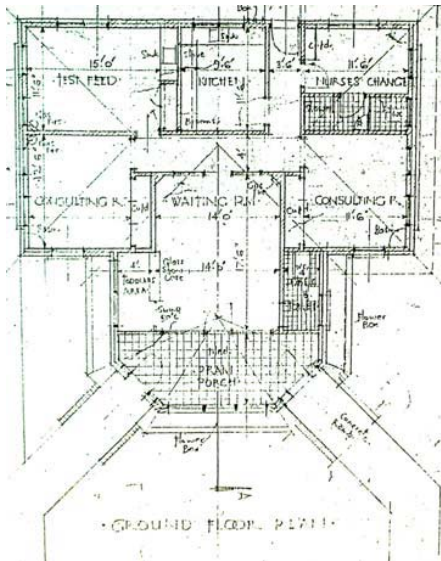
Ground floor plan of the proposed baby health centre prepared by R. Lindsay Little. Source: Sydney City Council Archives.
